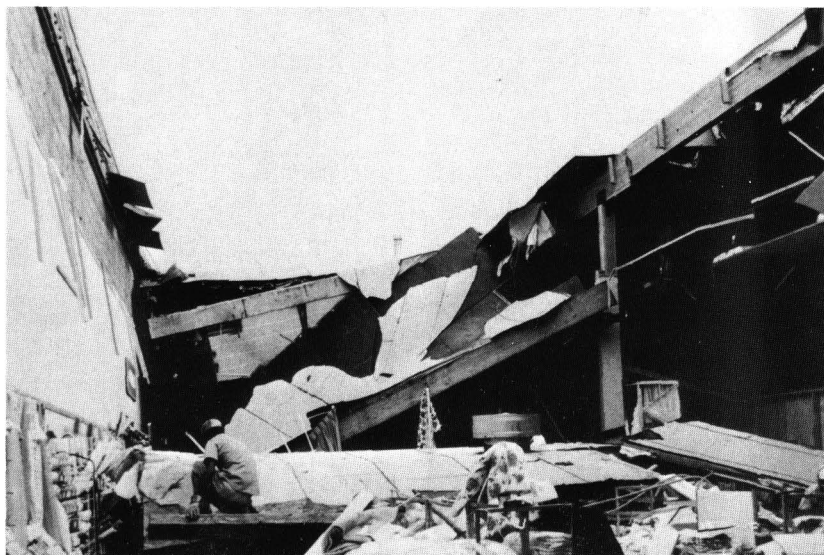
North Oaks Shopping Center, 19419 Soledad Canyon Road.
